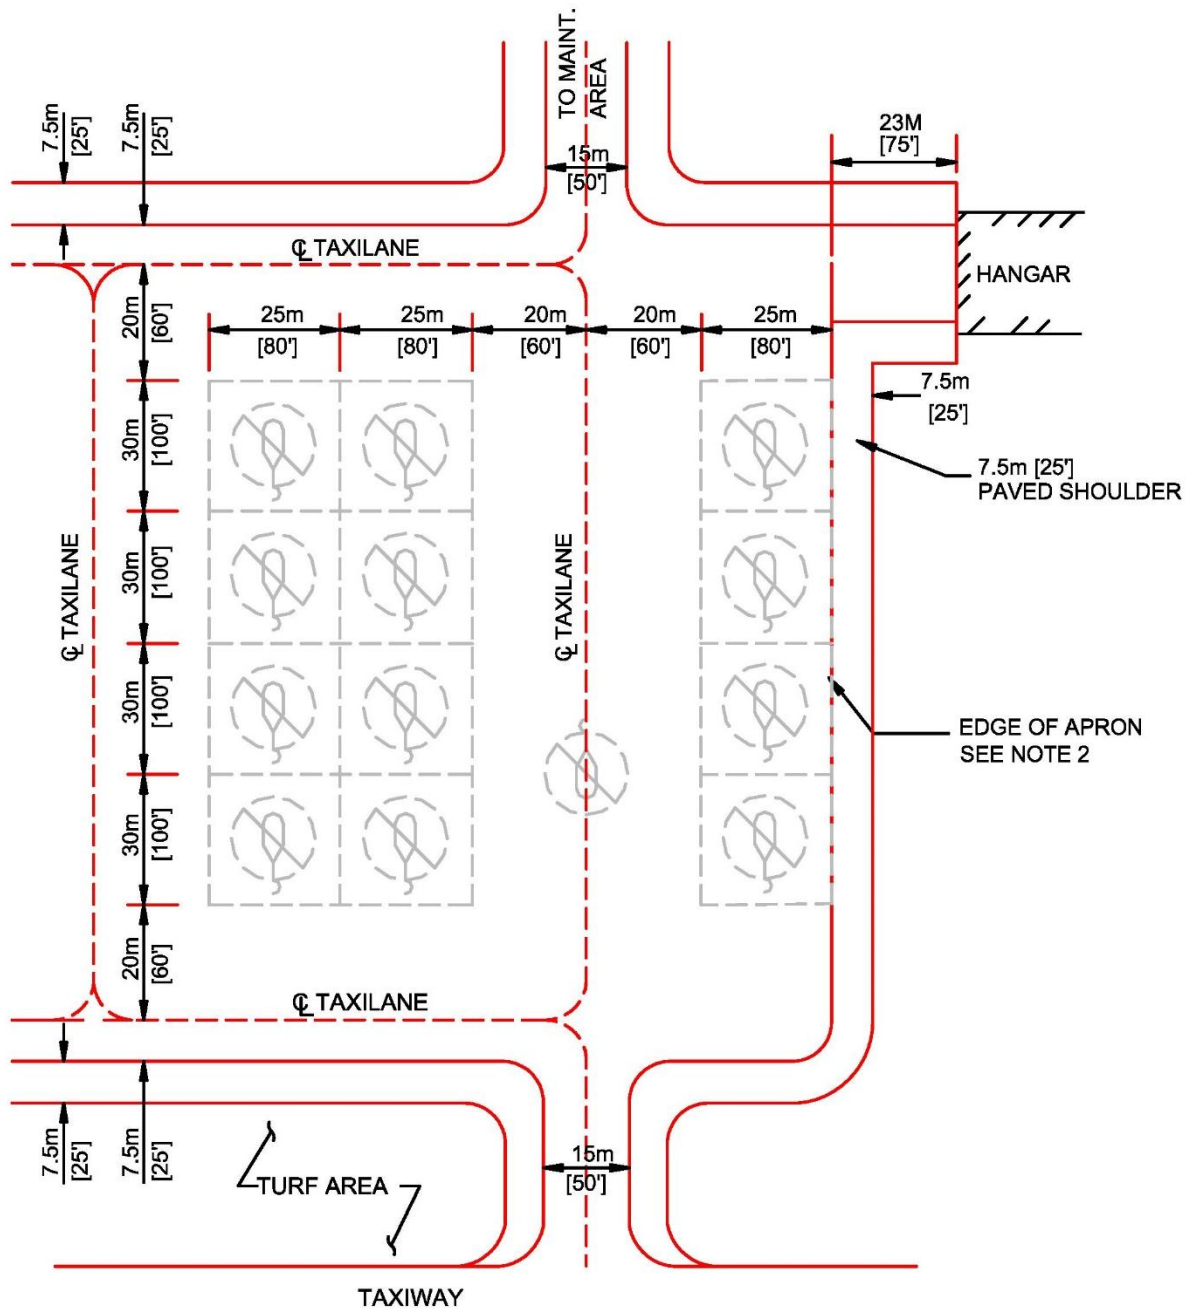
Army Type 1 Parking for CH-53 with Protective Barriers or Shelters
